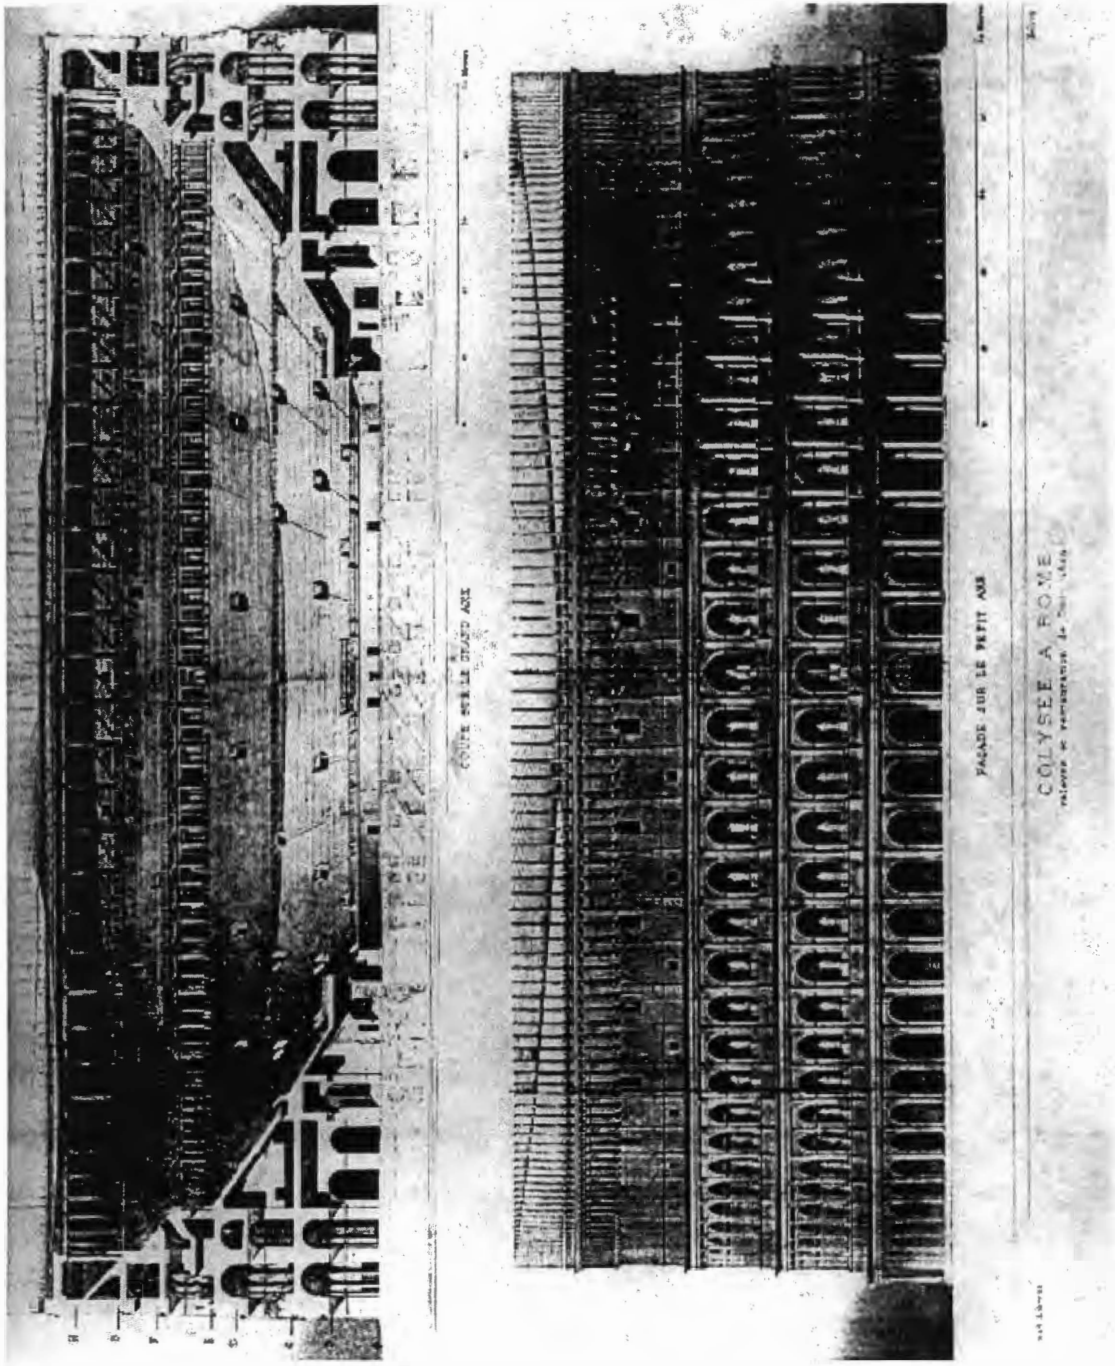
, SECTION AND ELEVATION OF COLISEUM (DESGODETZ)
